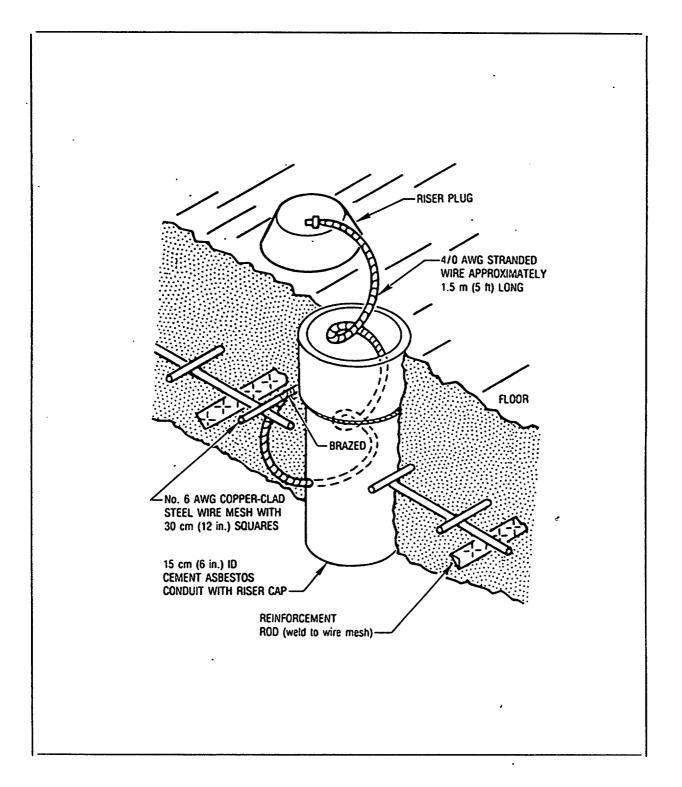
Typical Equipotential Ground Plane for New Construction - High Frequency Facilities Installation
